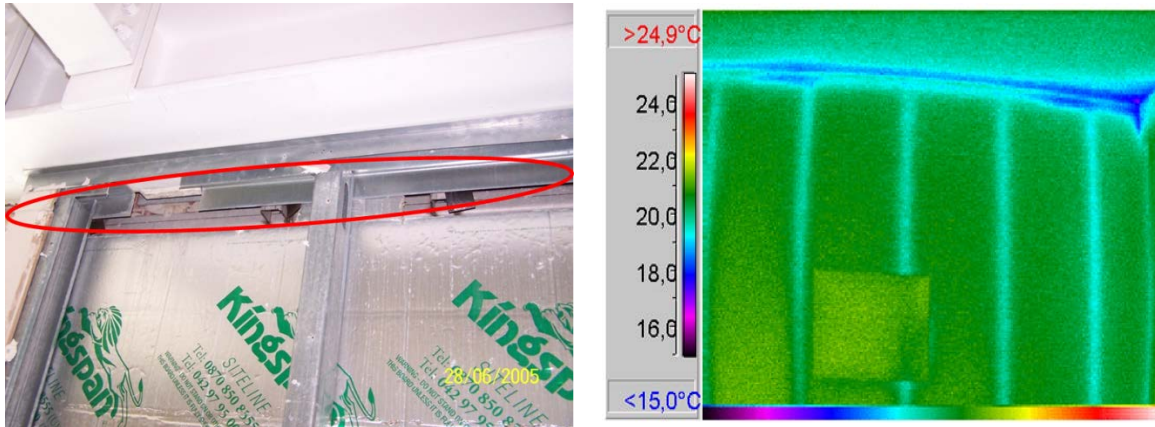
Thermal bridging due to poor workmanship (left) and construction type/design (right)
